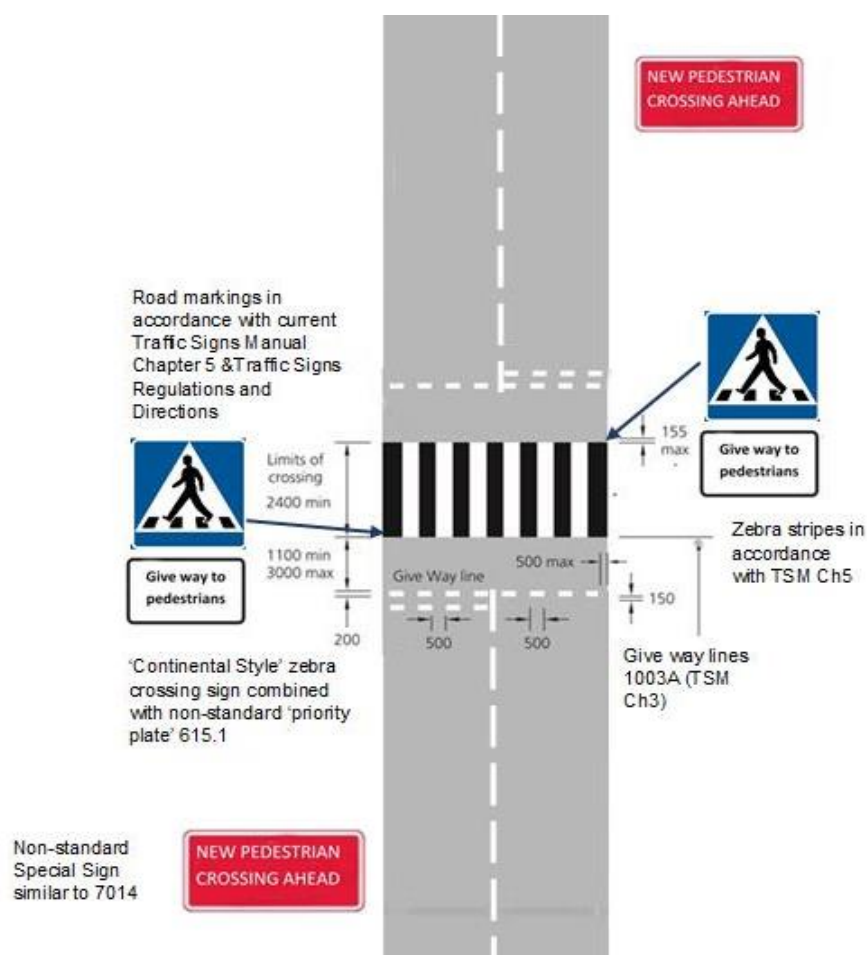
1 Sketch plan and proposed layout for trial continental style zebra crossings
